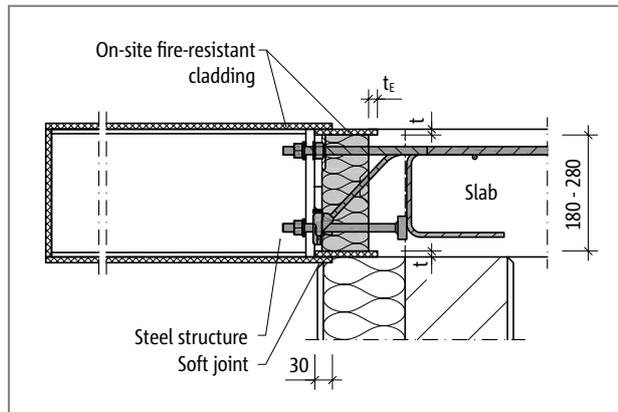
Schöck Isokorb® T type SK: on site fire-resistant cladding T type SK and steel structure; cross section
